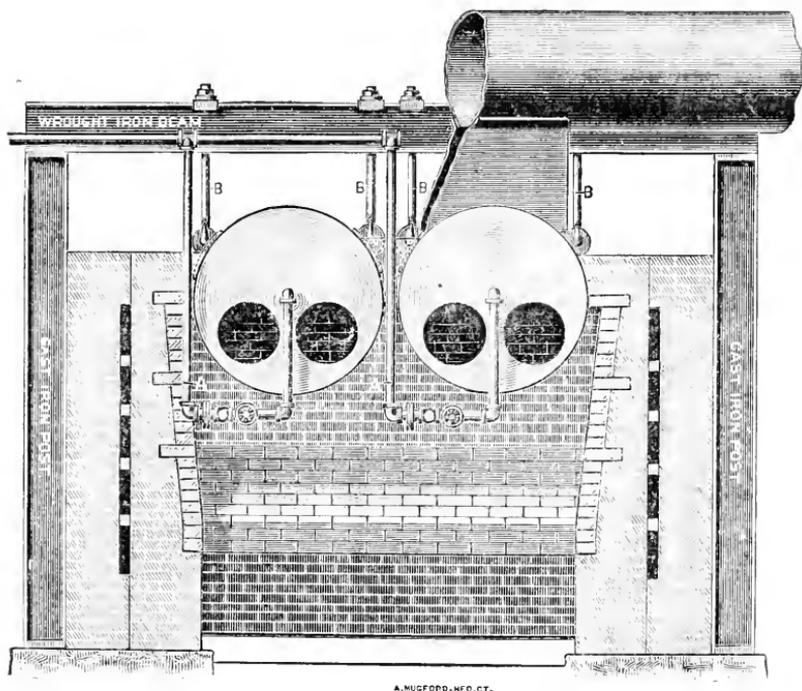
SETTING BOILERS OVER A SINGLE FURNACE.
